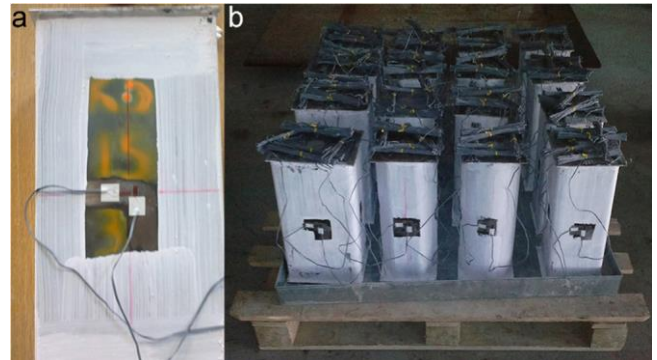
(a) Location of strain gauges and (b) final position of CFST specimens before tests.
